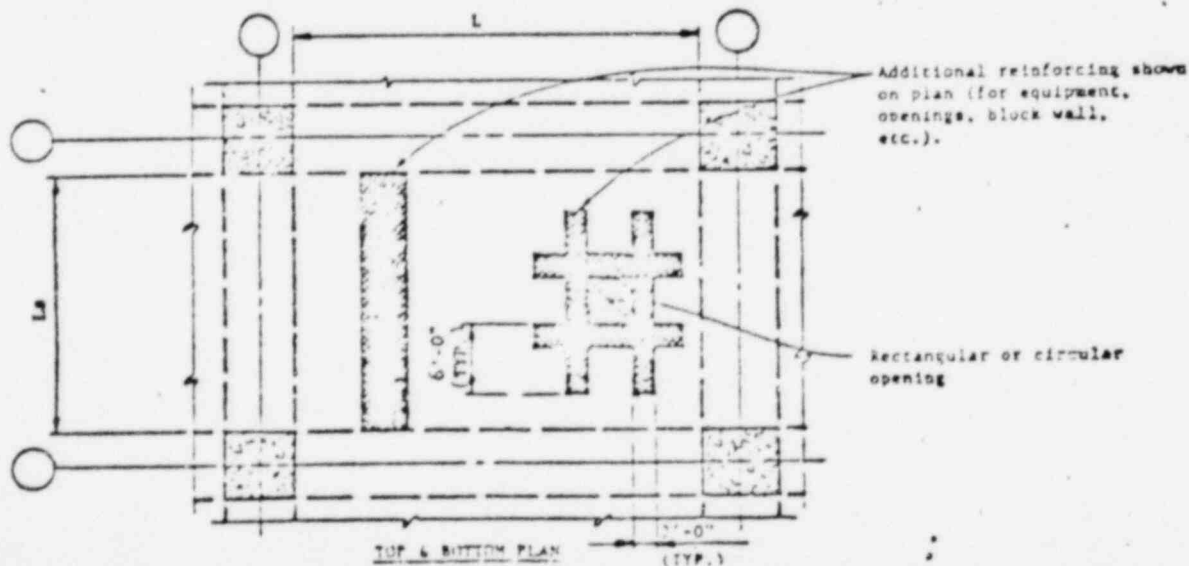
CRITERIA FOR DRILLING OF HOLES FOR EXPANSION ANCHORS IN CONCRETE SLABS
